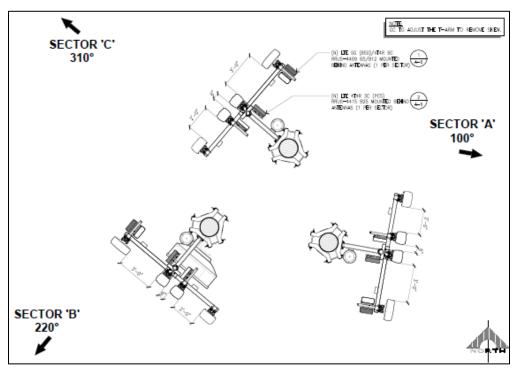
Proposed antenna layout plan (Source: Plans, page A-3, panel 2).
